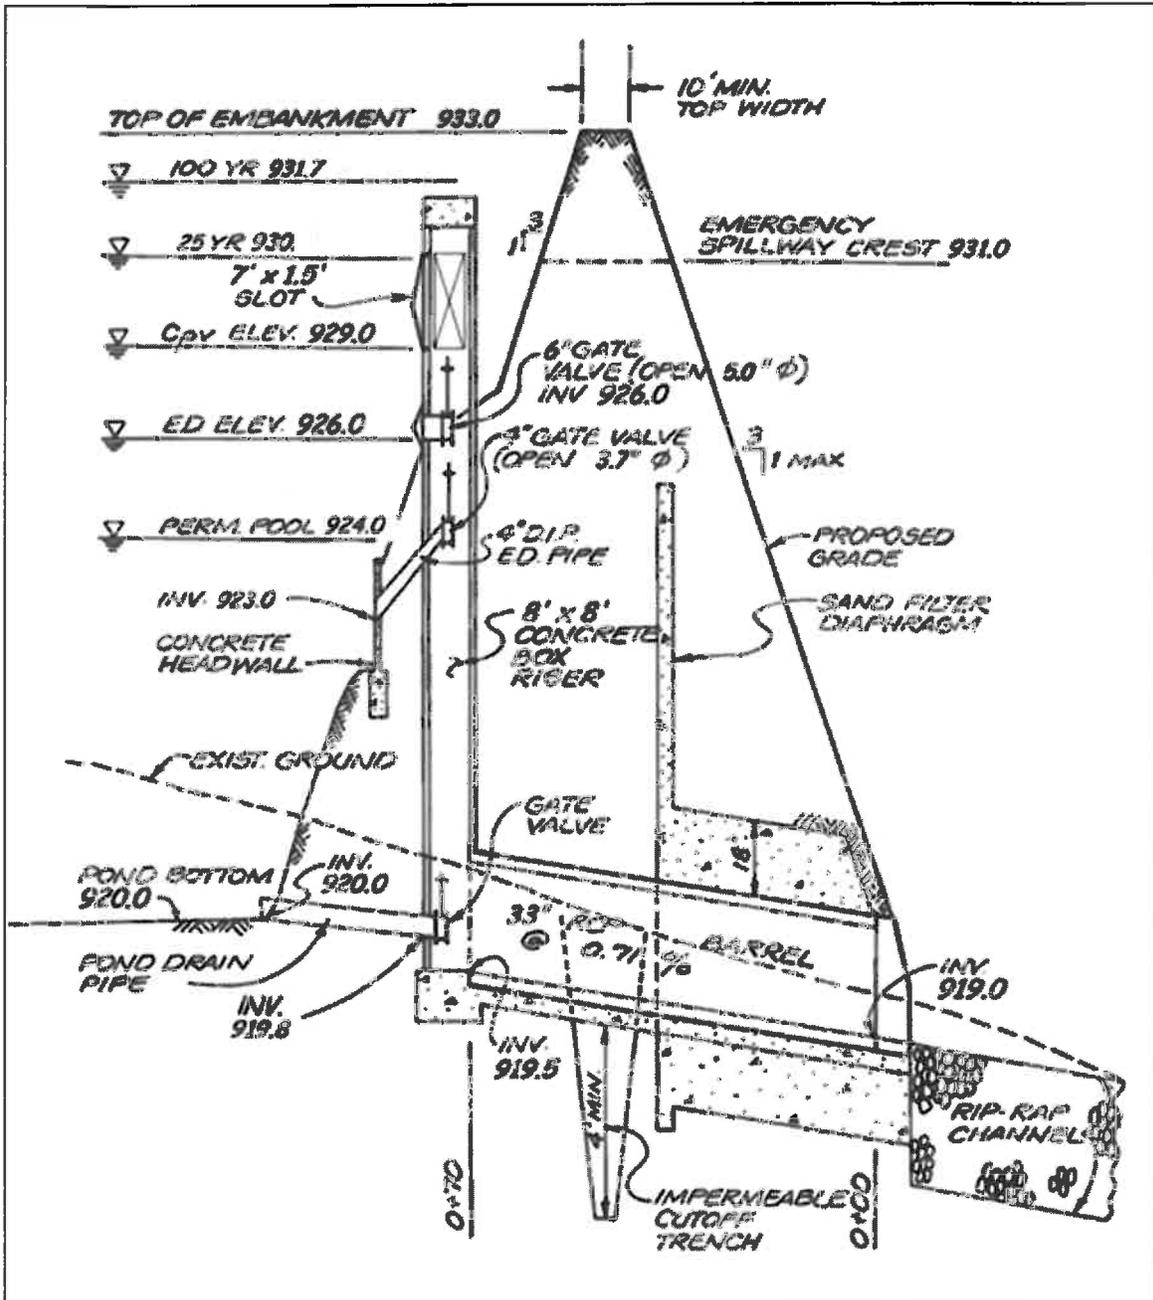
Example of Unified Sizing Criteria Outfall Structure Details
